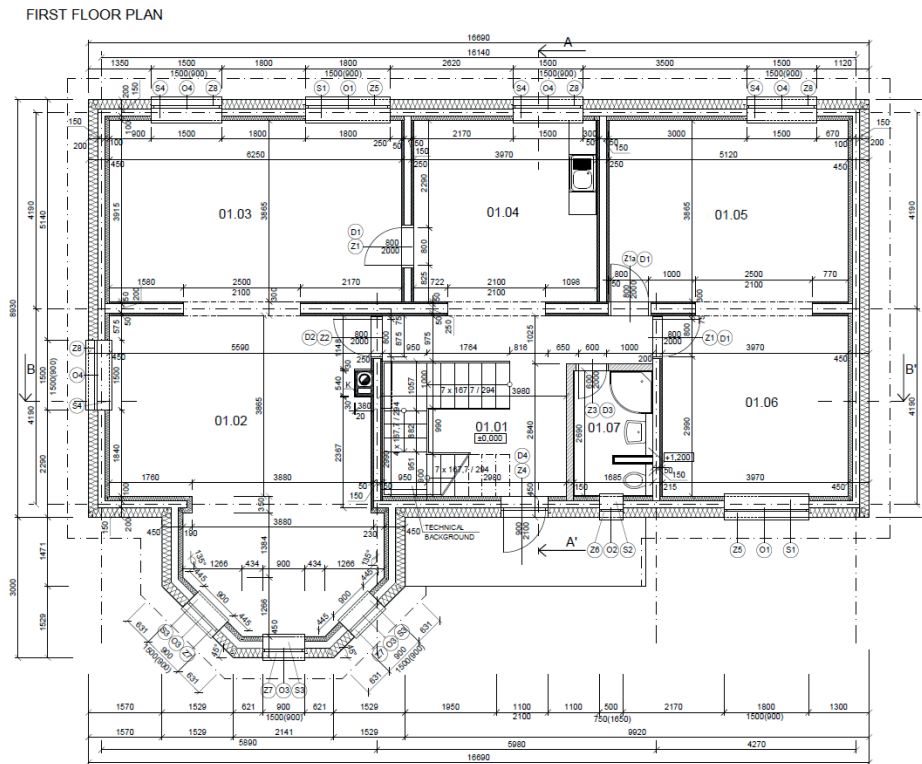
Prototype of prefabricated house IDA I. - floor plan of the first floor [2]
